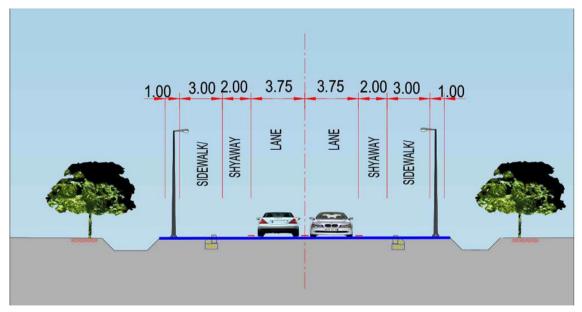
Igoma-Buhongwa Road - Road cross section without parallel parking
